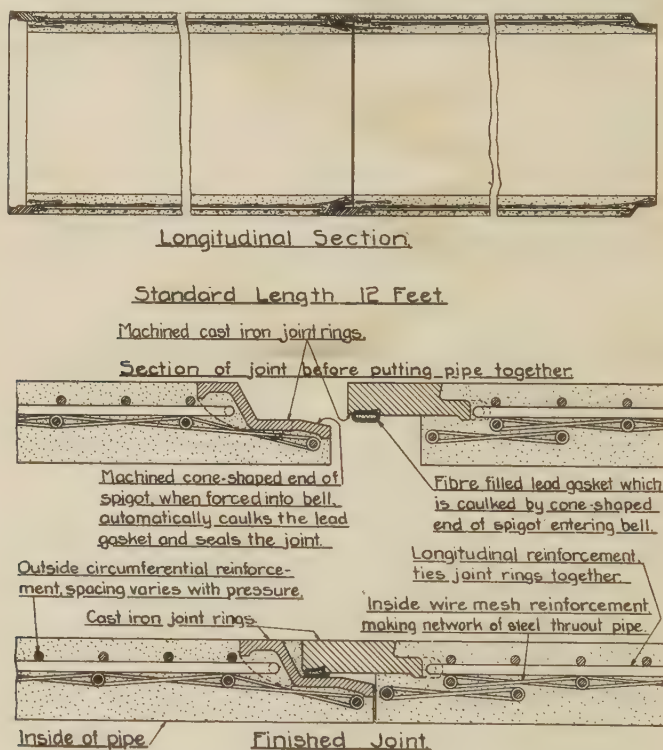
CENTRIFUGALLY MADE REINFORCED-CONCRETE PRESSURE PIPE WITH LEAD AND IRON SELF-CALKING EXPANSION JOINTS.
